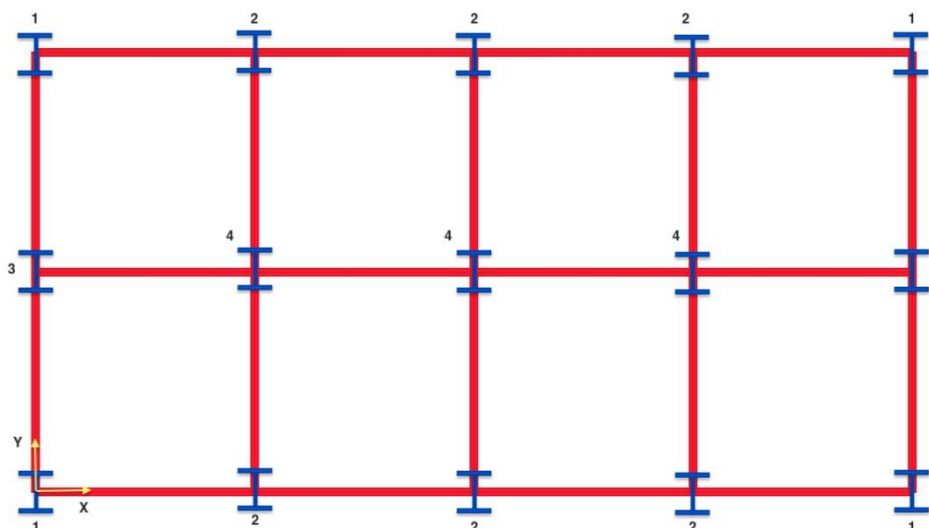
Columns grouping of the 3-story with 147-member steel frame in plan level
